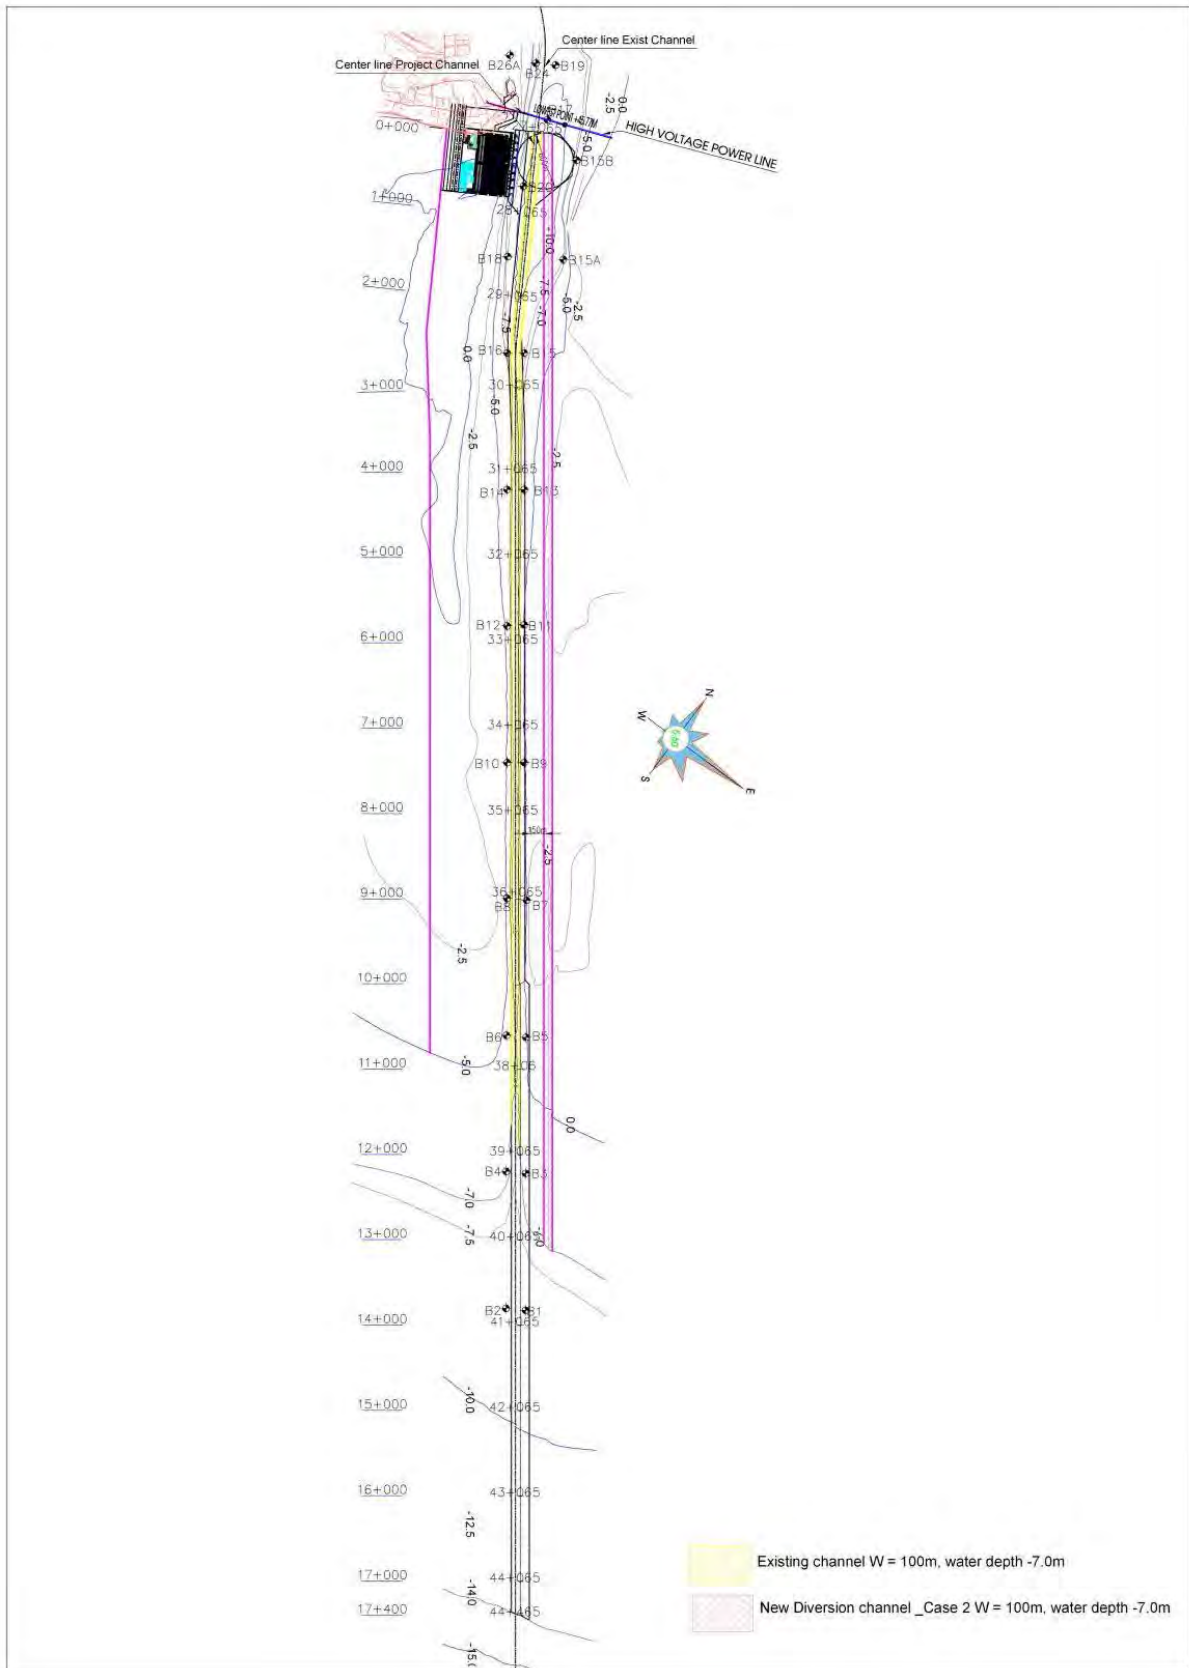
Cases 2, 6, 9, 10, 11, and 14 General Layout Plan of East Side Diversion Channel
